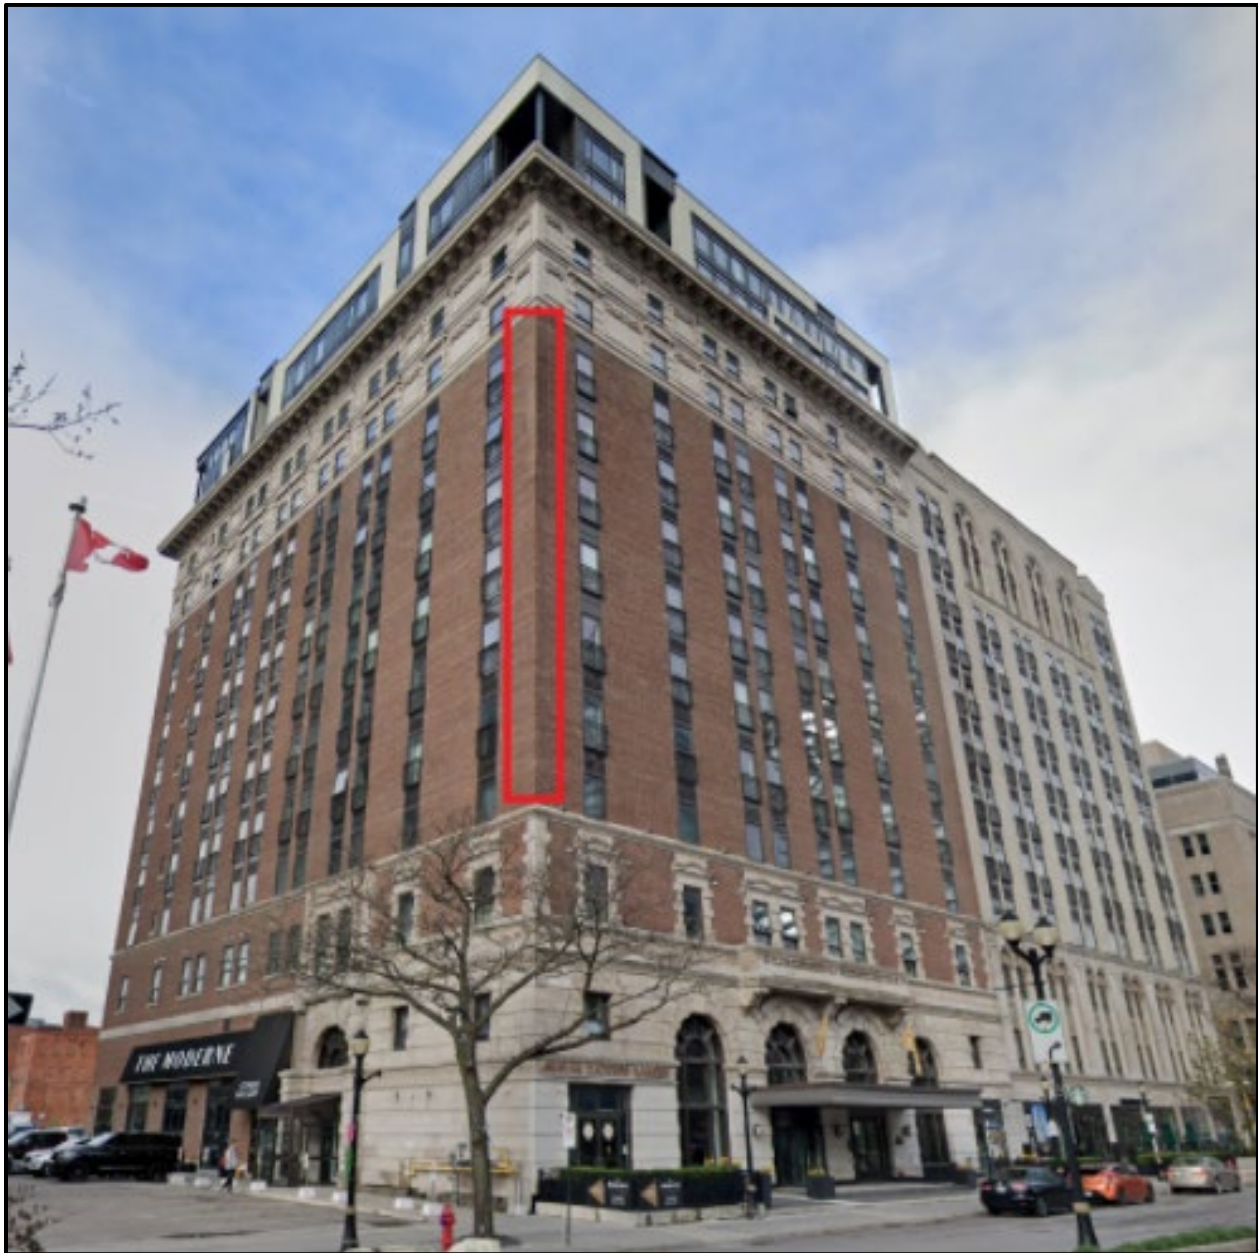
Front (north) and side (east) elevations of the Royal Connaught (Google Earth, 2023)
